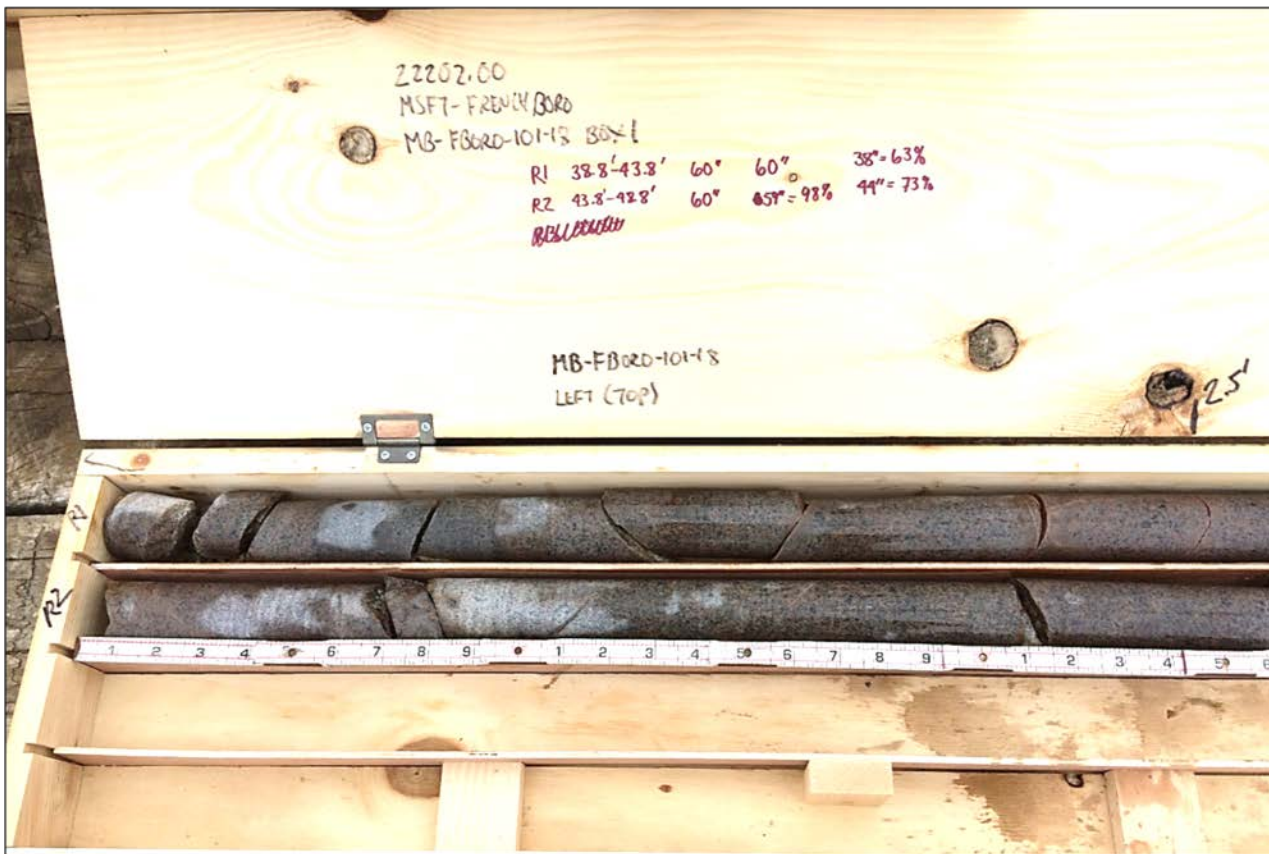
Core box containing wetted rock core from test boring MB-FBORO-101; left side of core box (top portion of cores). Slots from top to bottom:
